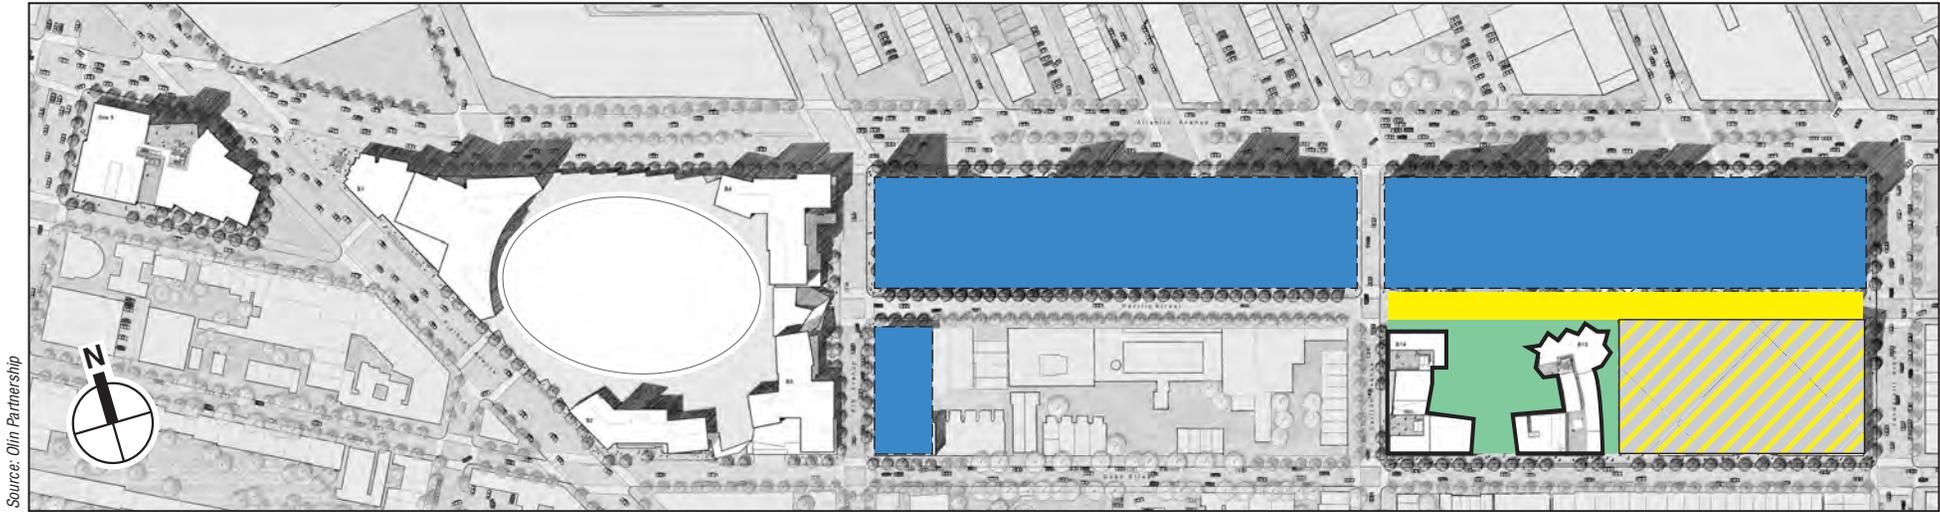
through S-9 depict the Phase II project site through early, intermediate, and late stages of construction under Construction Phasing Plan 1.
